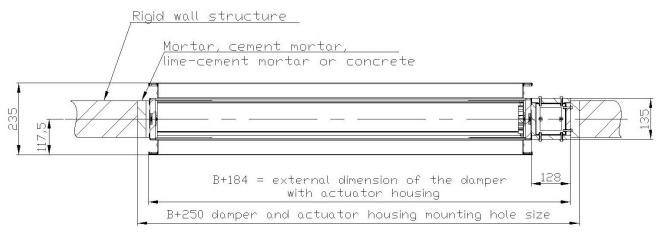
Installing method of WKP-O fire dampers in rigid wall
